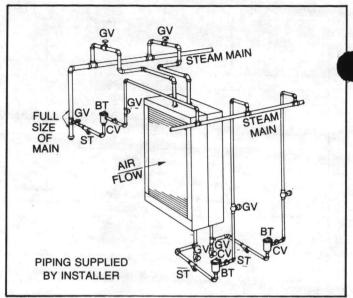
Typical Piping for Type A Steam Colls, High Pressure, Vertical Tubes for Horizontal Airflow
